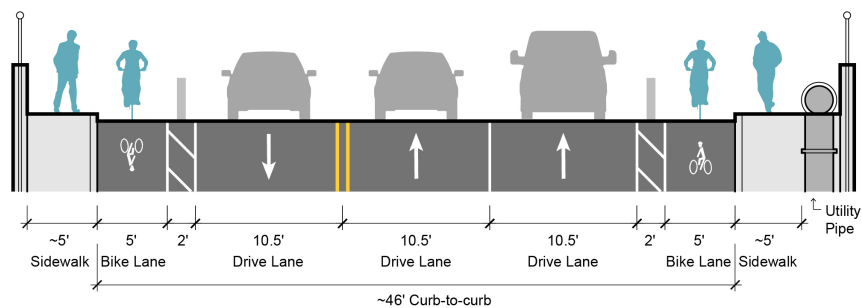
Dorchester Avenue / Haul Raod Bridge Proposed
